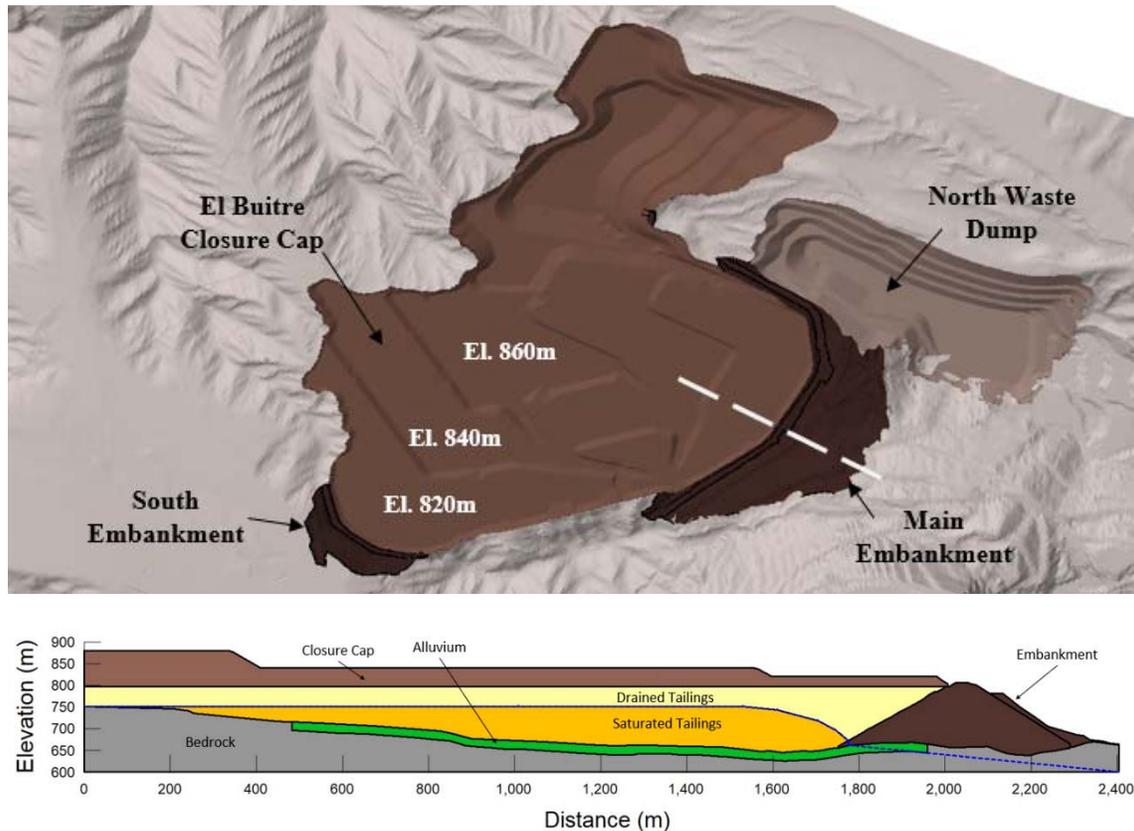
Plan and section of the proposed closure cap on the Candelaria TSF.
